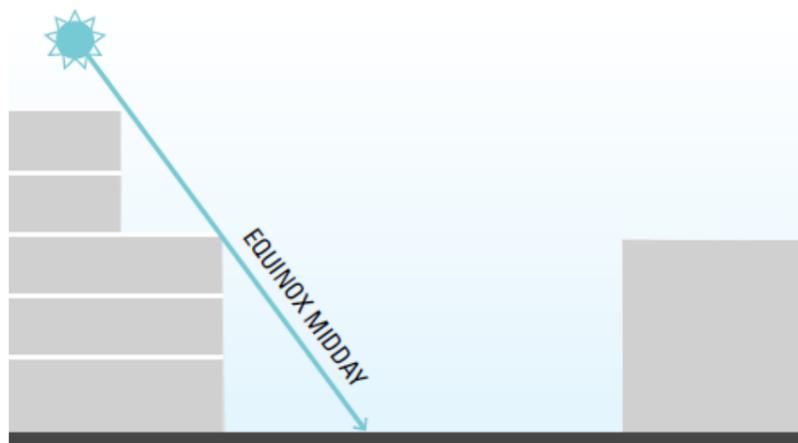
5M SETBACK WITH A FOUR STOREY STREET WALL, WITH NO HERITAGE FACADE OUTSIDE OF DIMMEYS VIEWSHED
